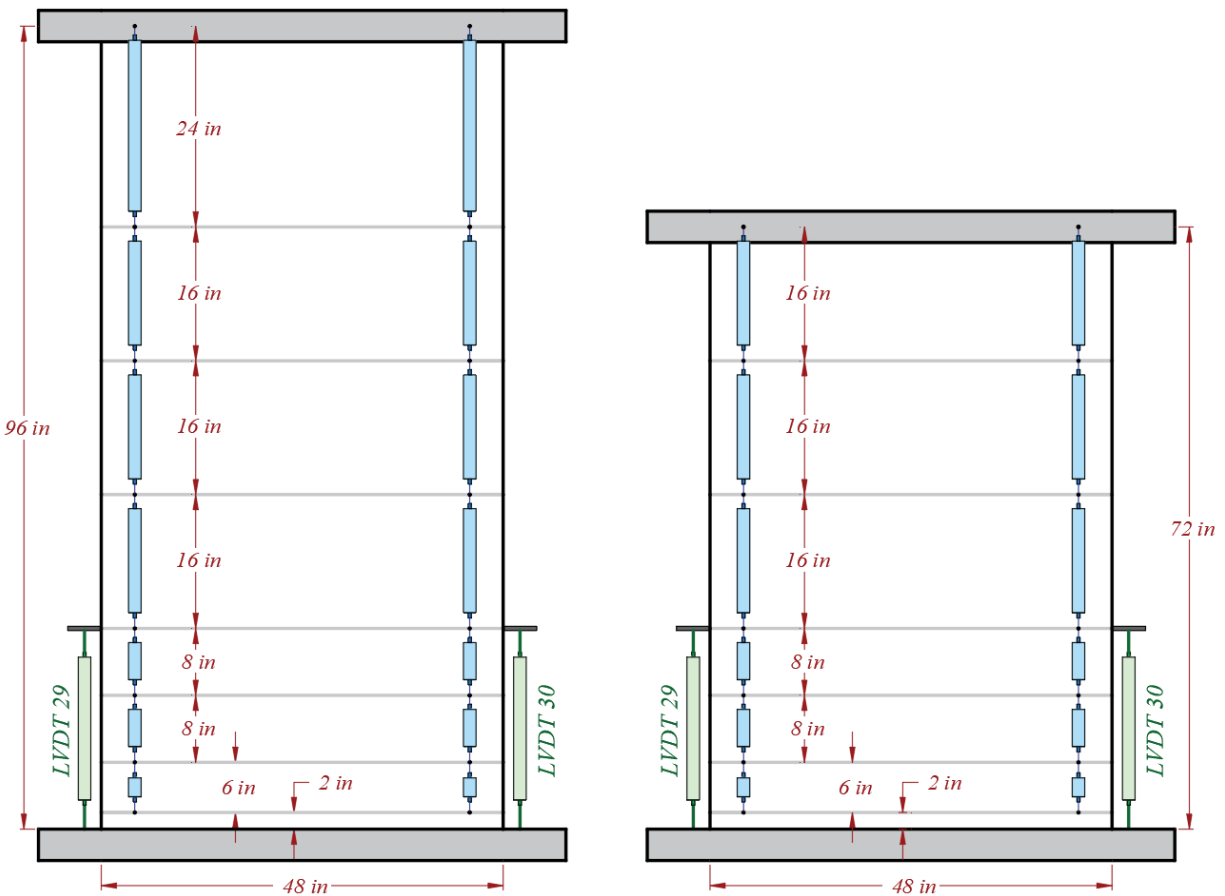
Layout of LVDTs used for measuring curvature in tests conducted by Tran and Wallace
